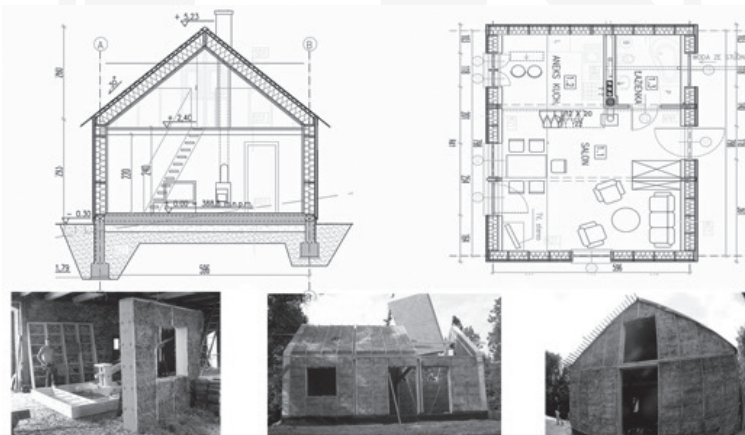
Summer building situated in Gajowiec near Mirsk – plan, section, the assembly process [11]
